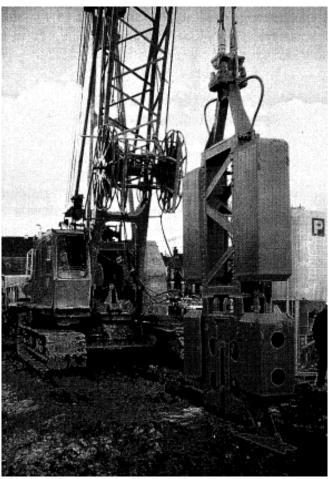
Excavator during construction phase of a diaphragm wall (Charles et al 1996)
